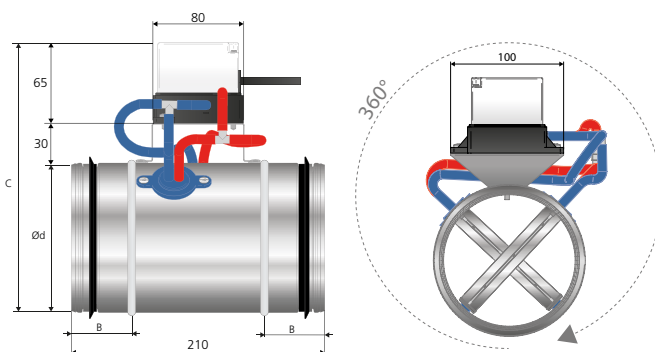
Dimensions (mm), REACT M circular. The damper can be installed at an optional angle.
